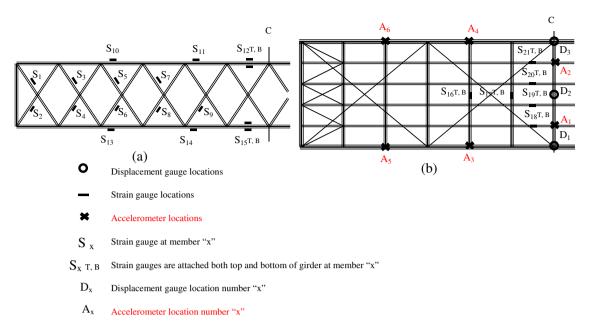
Locations of the strain gauges and displacement gauges (a) main truss girder and (b) horizontal bridge deck.
